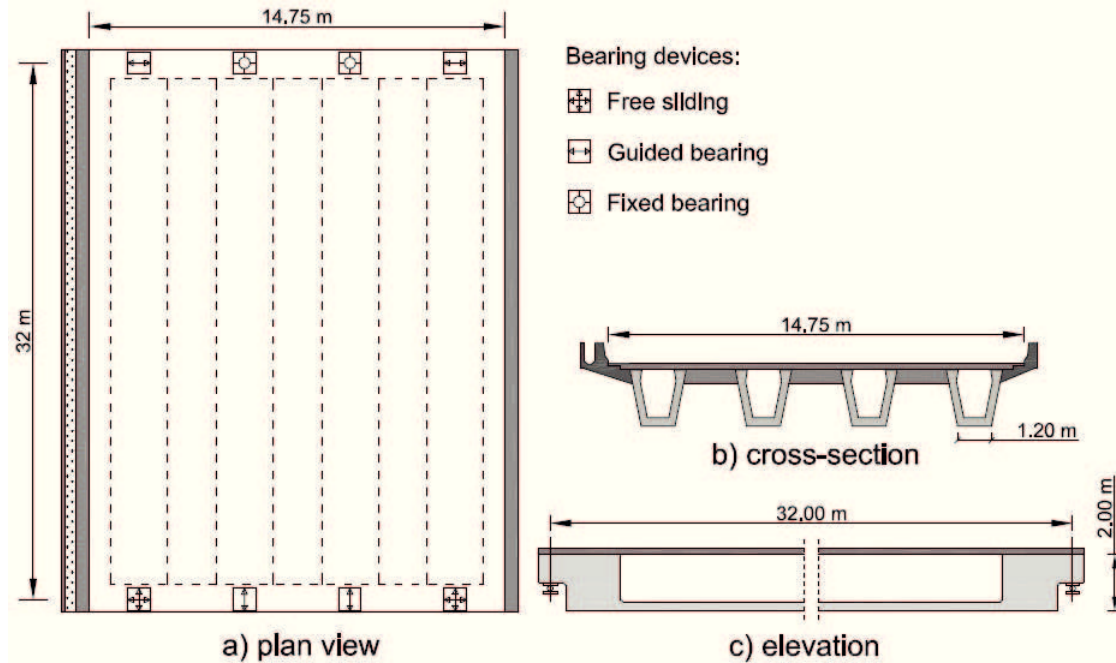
Plan view a), cross-section b) and longitudinal profile c) of the bridge. The flyover is a 32-meter-long span reinforced-concrete bridge that consists of four precast beams with cast-in-place diaphragms at the abutments. The cast-in-place concrete deck connects all the beams and the two precast concrete barriers.
